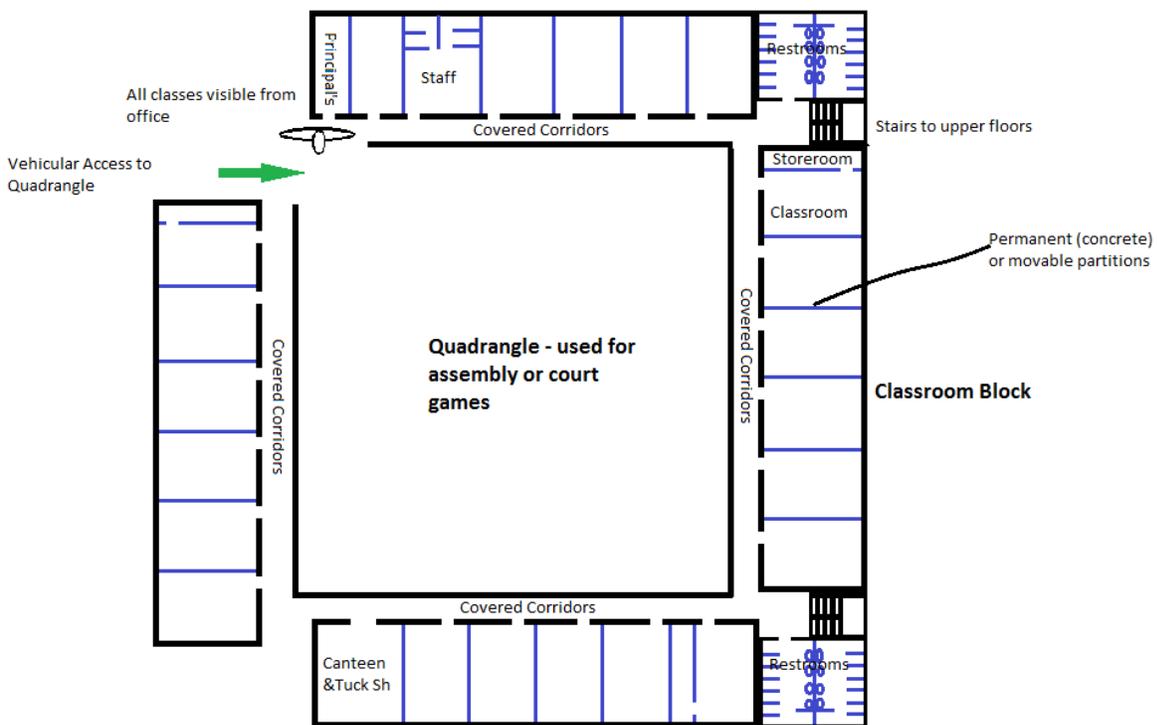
Sketch showing the layout of a typical medium to large size primary school. A modification to this design resulted in U-shape or L-shaped arrangement where only three or two class blocks were present.
